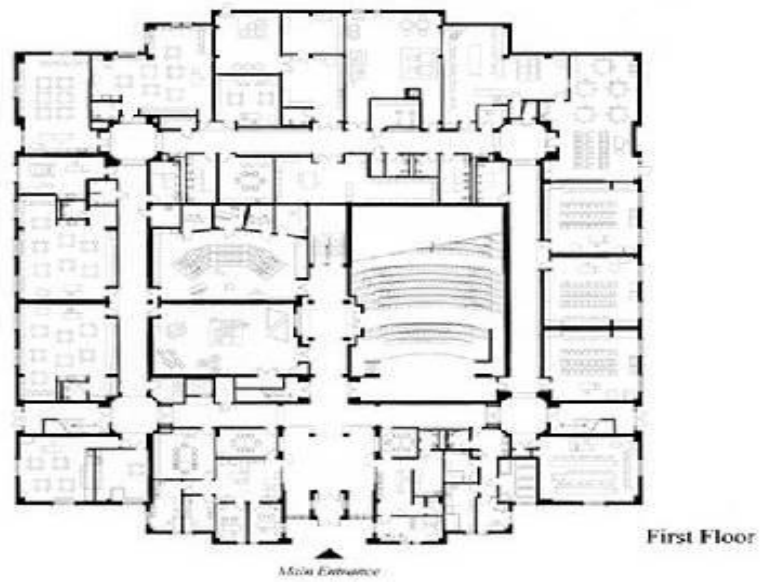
Beebe School, Malden, Massachusetts: First Floor Plan
